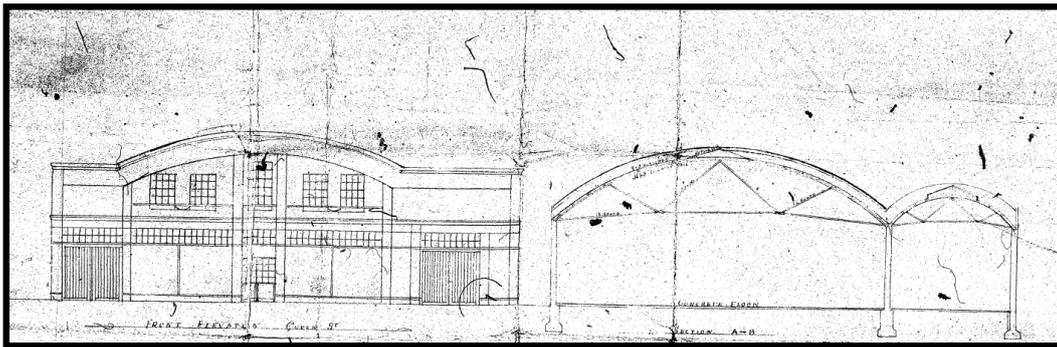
1925 street elevation and section, showing asymmetrical facade. (Source: HDC property file)
